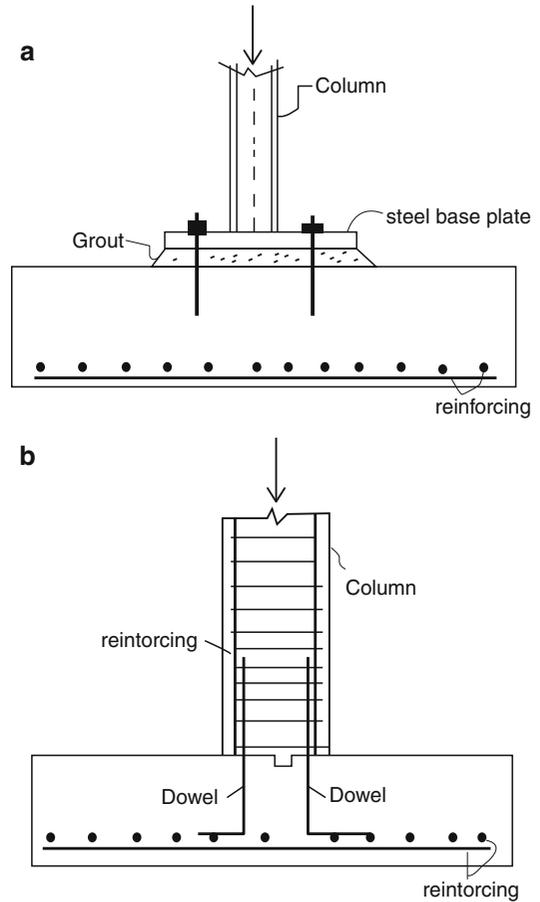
illustrates steel reinforcement for steel and concrete columns. A steel plate is welded to the base of a steel column and anchored to the footing with bolts embedded in the concrete. Dowels are used to connect the longitudinal steel in the concrete column to the footing. Usually the column loading is purely axial and the support is considered to be simply supported. However, there are situations where moment as well as axial force is present in the column. The design strategy is the same for both cases.
